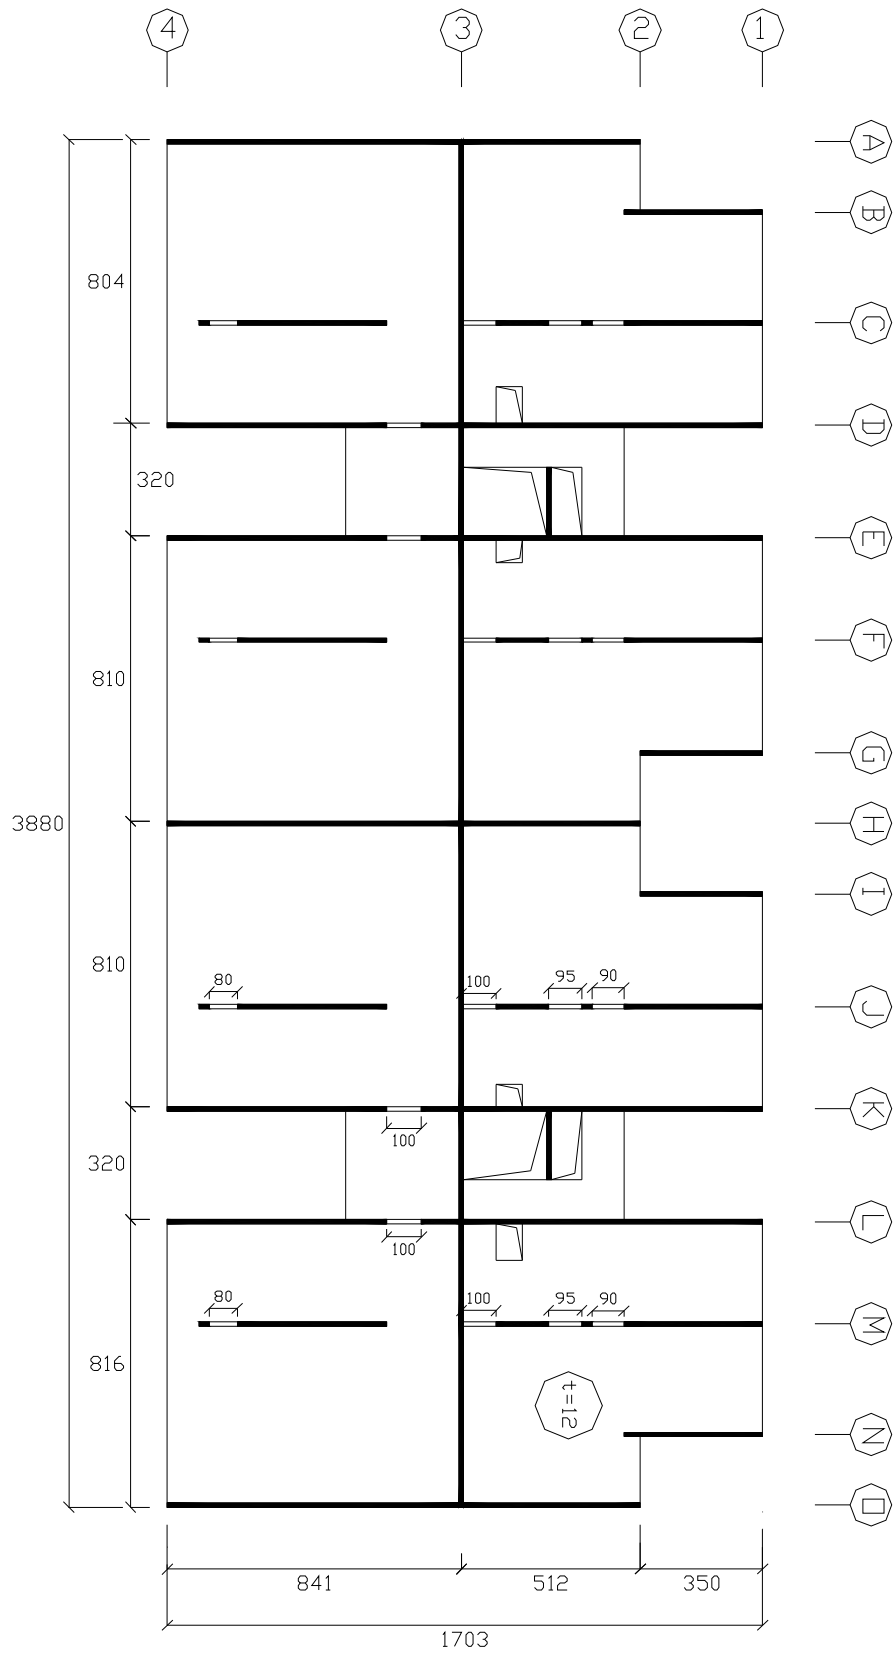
Typical plan view – Plan No. 3 (units in cm)
